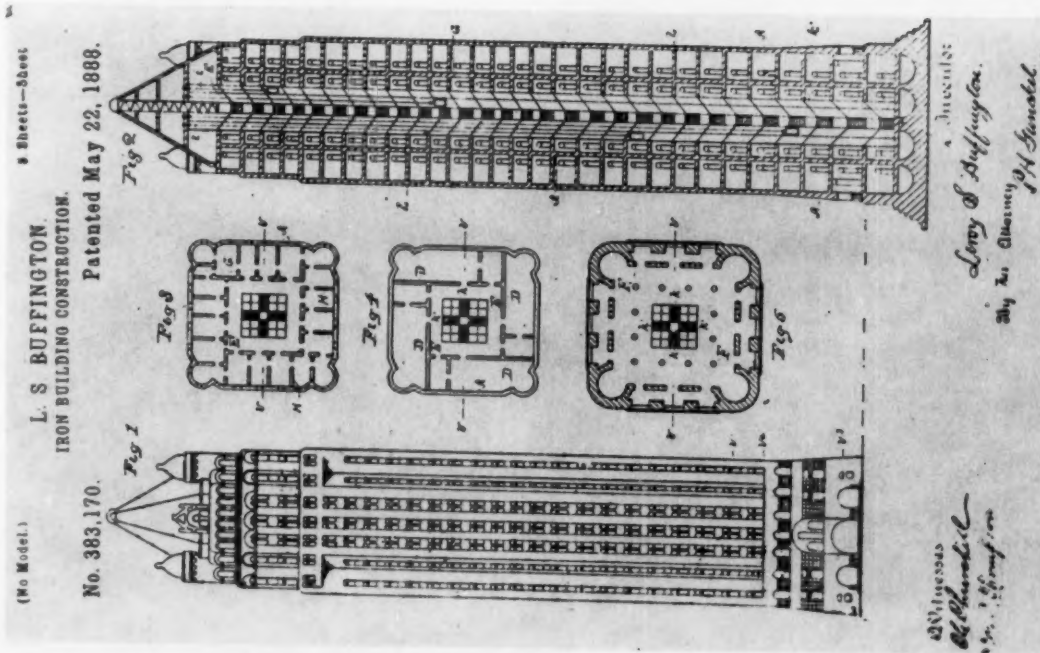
Elevation, Plans, and Section of Patented Building, Designed in 1887
